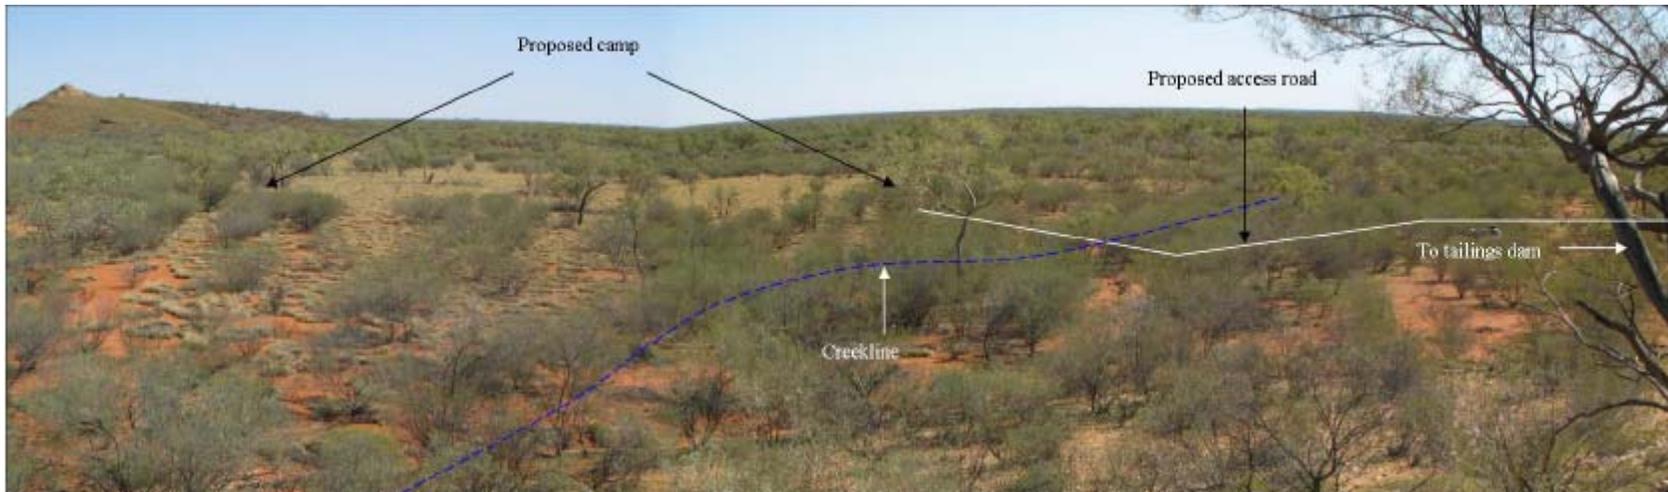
Perspective south-west over proposed camp access road (Molyhil Mine PER App 4, 2007)
